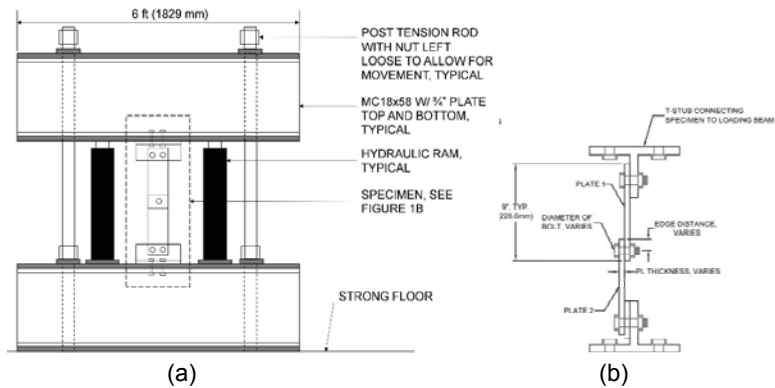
Testing frame for bolt shear and plate bearing lap splice joint (a) Elevation view of test setup with elevation view of specimen dimensions and setup, (b) Profile view of specimen setup
